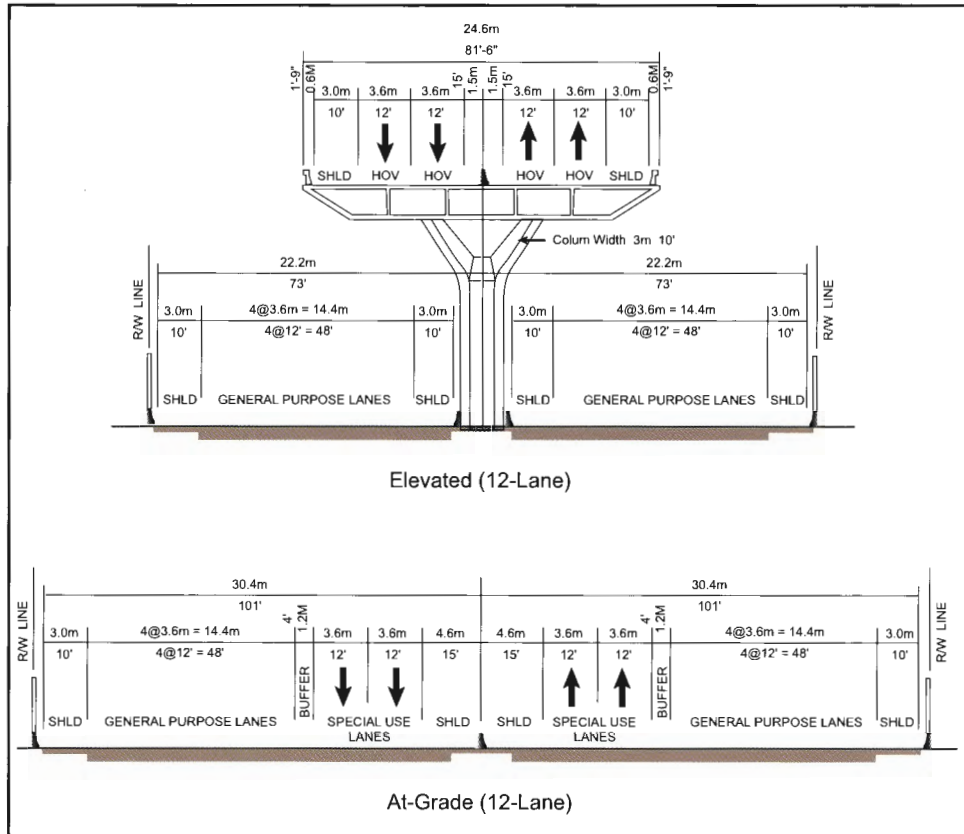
Alternative 6 At-Grade and Elevated Cross Section
